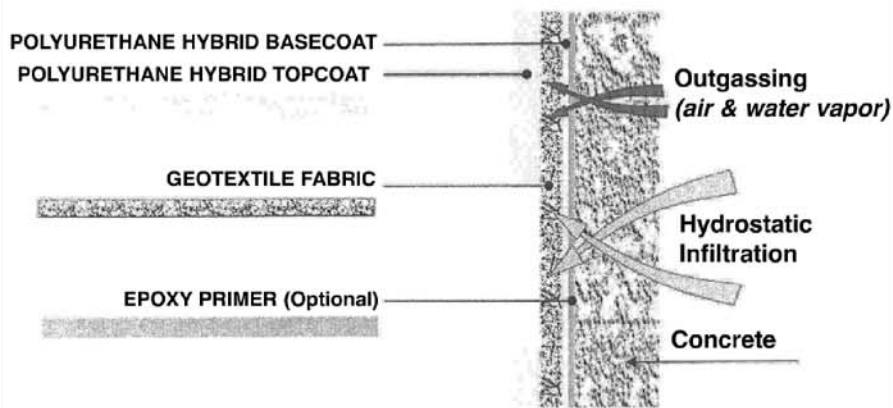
Bonded geomembrane (polyurethane hybrid) to a concrete wall
